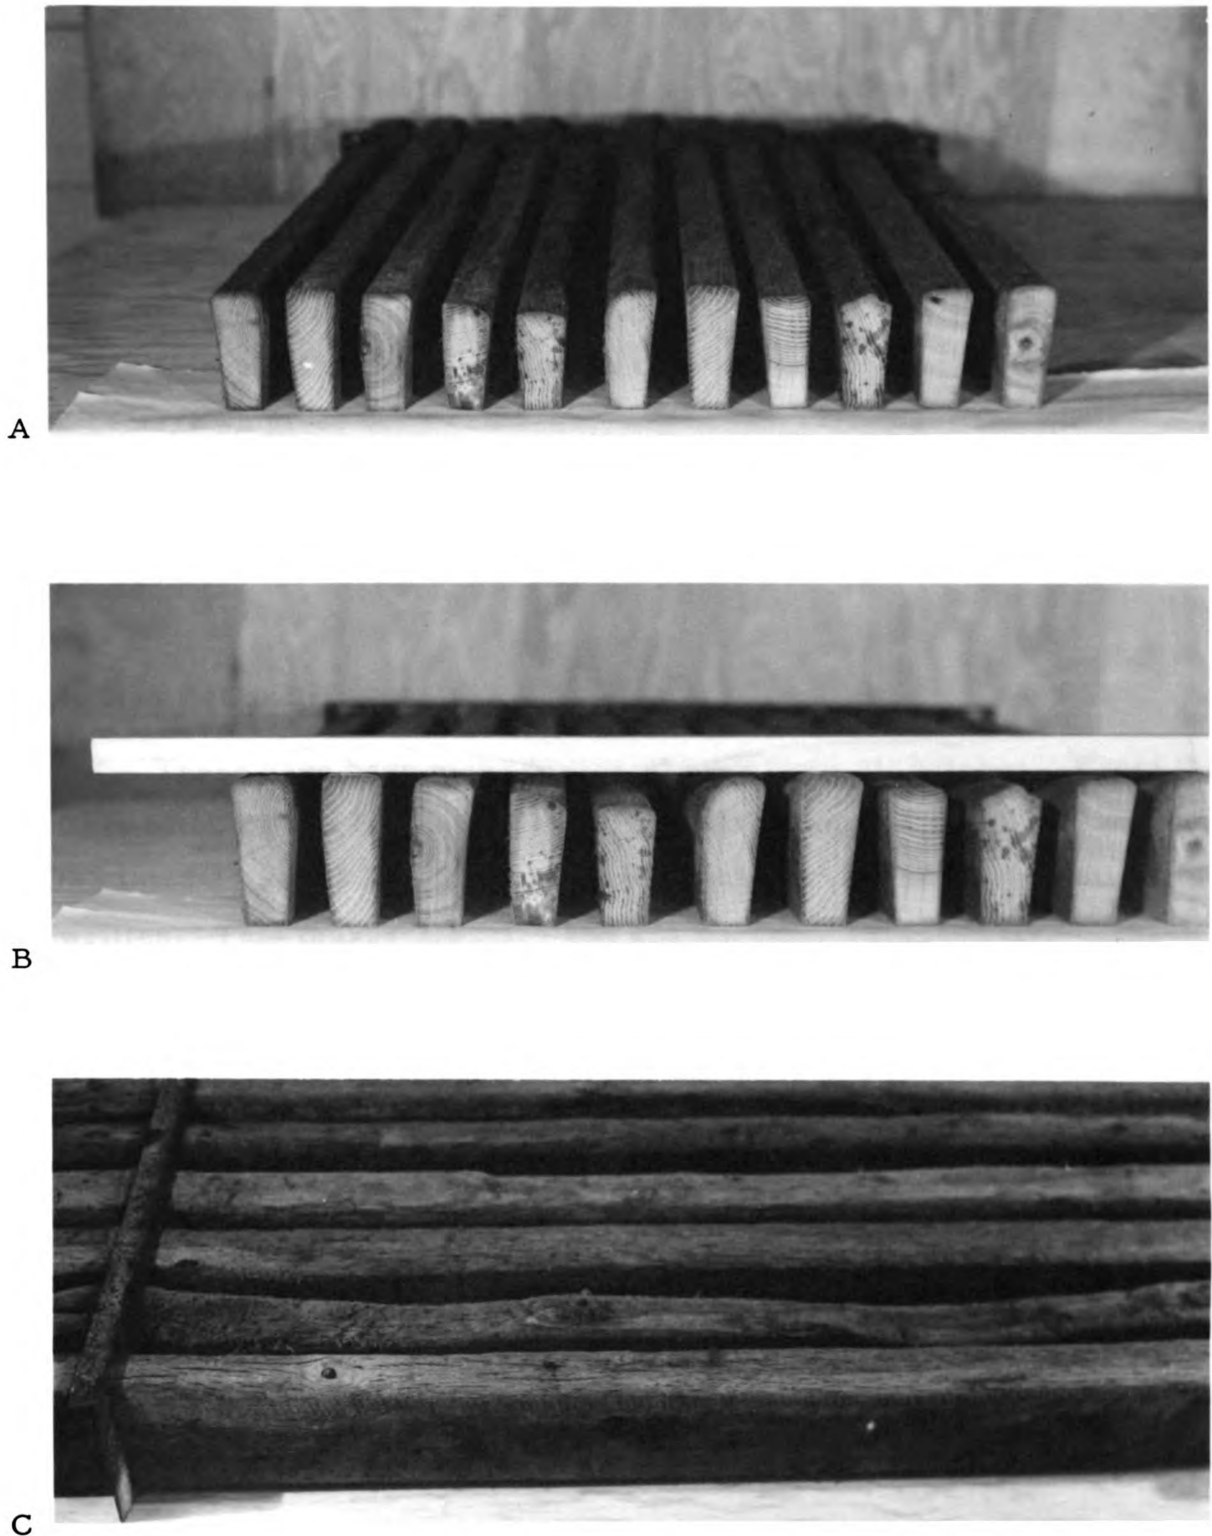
Cross-section (A and B) of a slatted floor section illustrating the wear after eleven months use. Sideview (C) of a part of a floor section badly worn. M.S.U. Photo No. 631562-4(A), 631562-3(B) and 631562-5(C).
